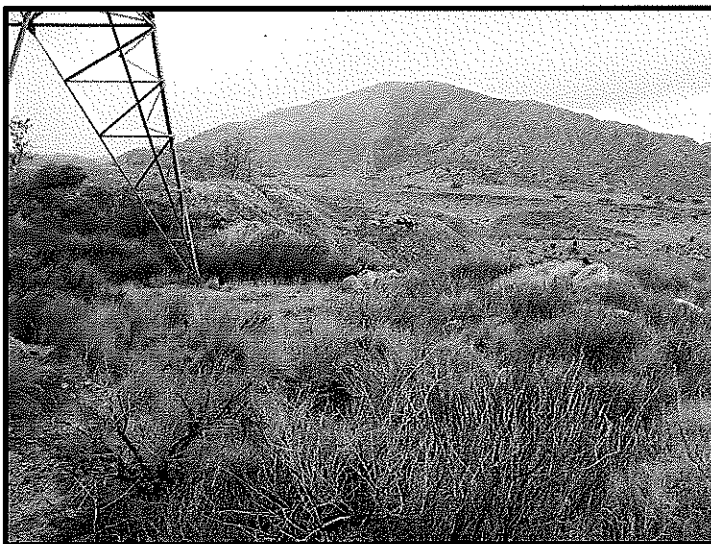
Devers-Vista #1 and #2 tower leg, adjacent to East Pit. Distance from the tower leg to the brow of a 100-foot-high descending cut slope (out of view) was measured at 17 feet. Foreground vegetation could be representative of “natural” conditions, as the tower footprint is one of the very few and very small areas of undisturbed ground.
